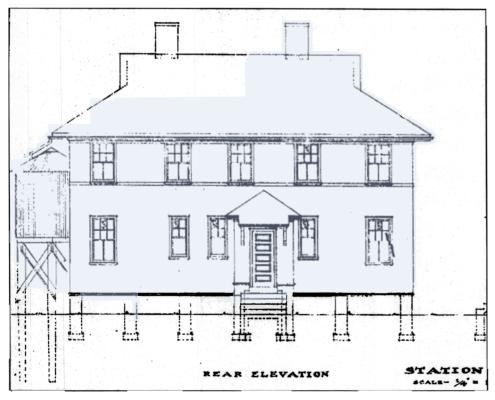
Original drawing of rear (north sound-facing) elevation of station house; note cistern at left (Source: Coast Guard Academy Library)
